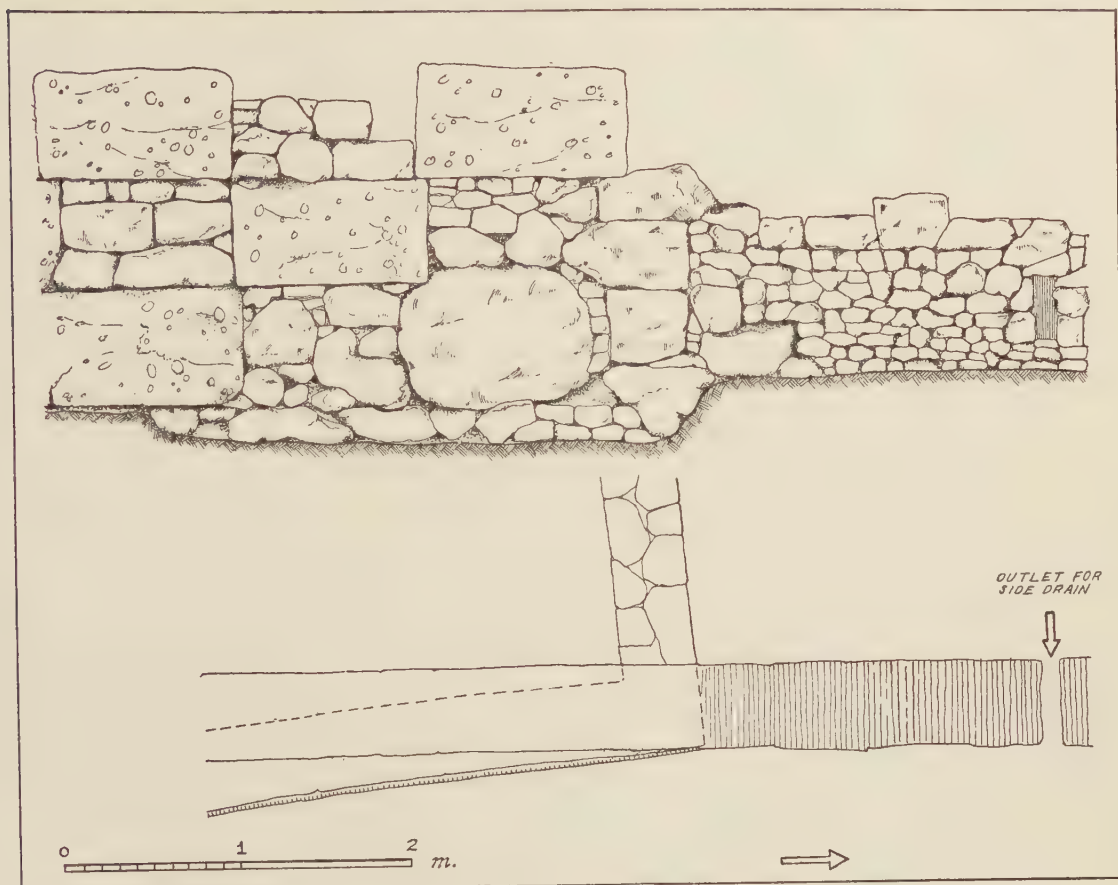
Houses A and B: Elevation of East Wall of Second Period, and Plan to show Line of East Wall in both Periods.
